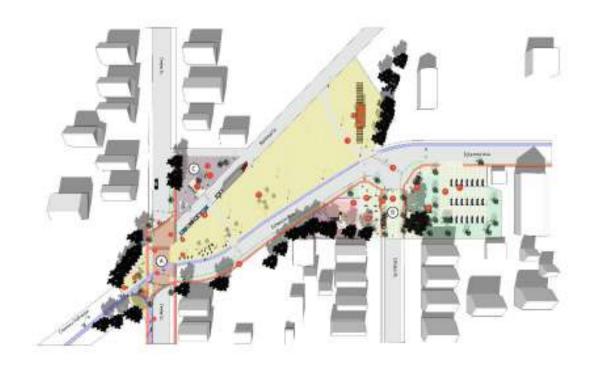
Plan view of conceptual design plan for Eckerson lots
